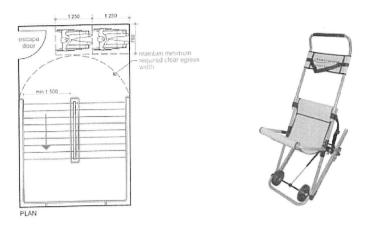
&5: Stair with Evacuation Chair. Muller, P., 2013. Architecture: Building Construction Standards for South Africa. In: Architecture: Building Construction Standards for South Africa. Paarl: Architecture Publications (Pty) Ltd, pp. 72-101.
